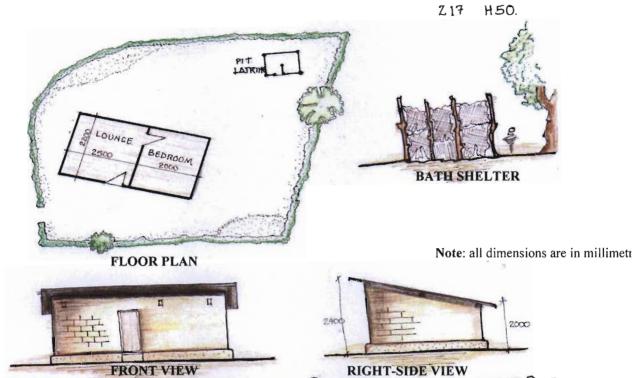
Sketch plans, front and right-side views and bath shelter of House No. Z17-50 Kamatipa, Kitwe (source: author 2005)
